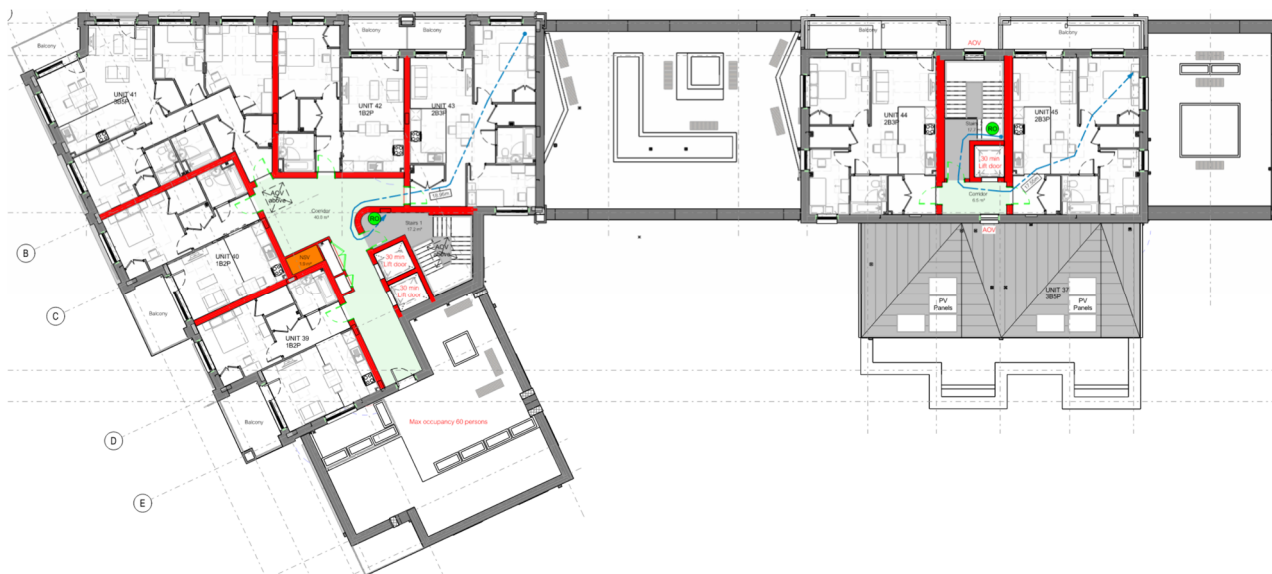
Fourth floor layout (Dwg No: M9534-HUN-02-04-DR-A-05-4004).
